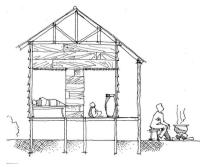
Section showing initial IDP camp dwelling with cooking done outside
